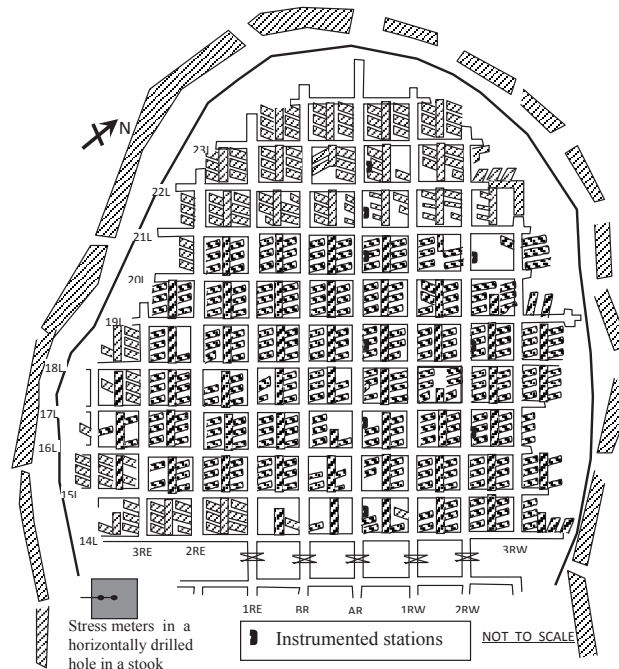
Plan of the instrumented panel ‘C’ showing location of instrumented stations.
